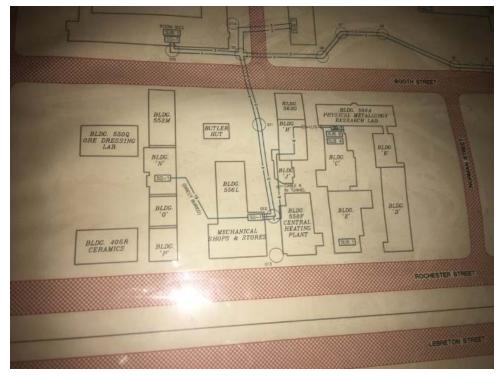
Plan on the Site and underground service tunnel that was located on a wall at 552 Booth Street.
